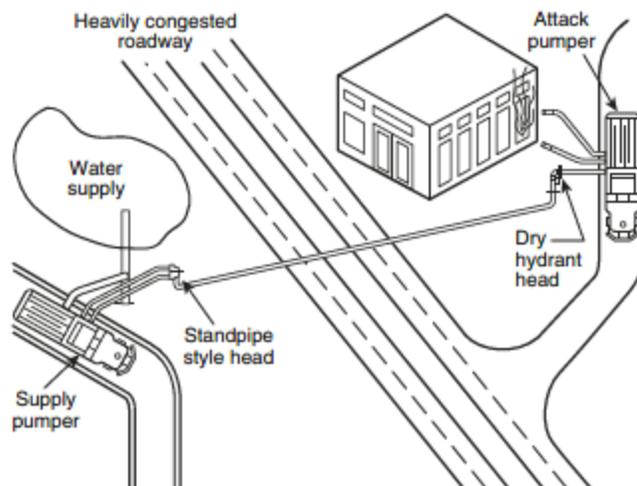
(b) Overcoming Roadway Obstructions in Supplying Water to a Building.
